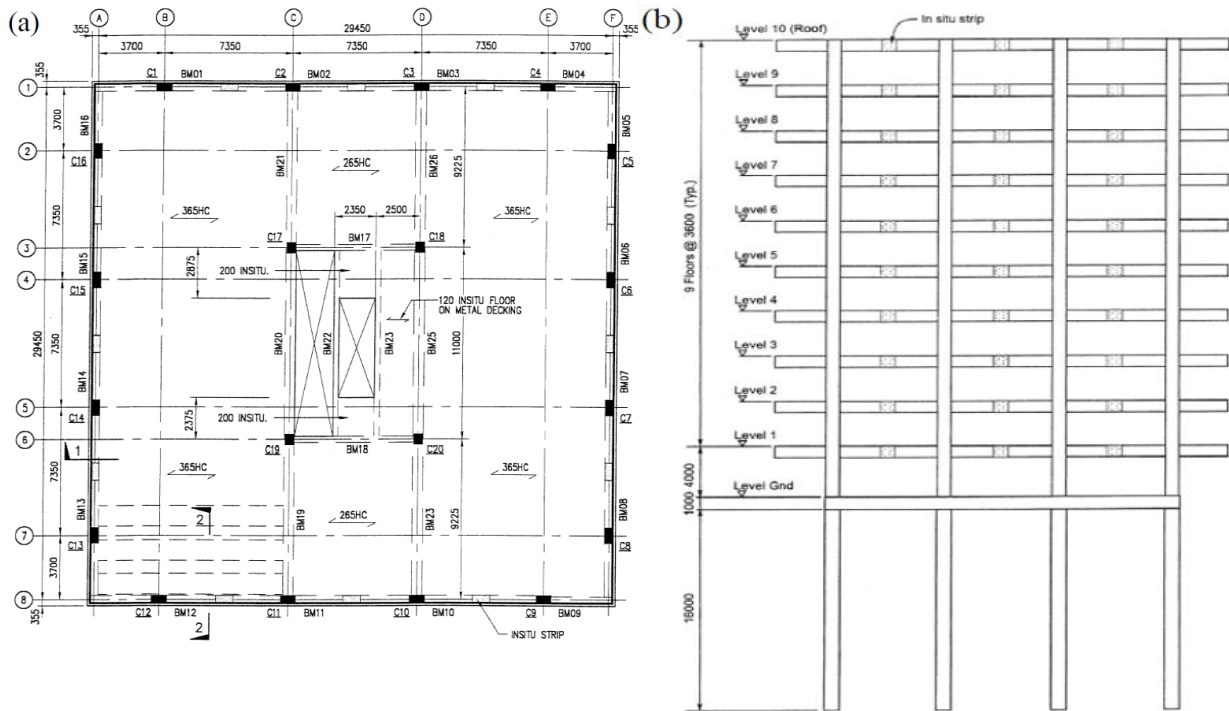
Plan and elevation view of New Zealand Red Book building used as the case study
